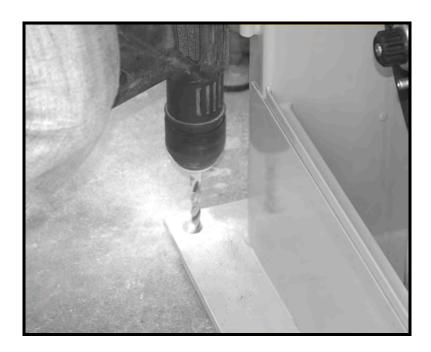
Drilling Pilot Holes for Concrete Anchors
